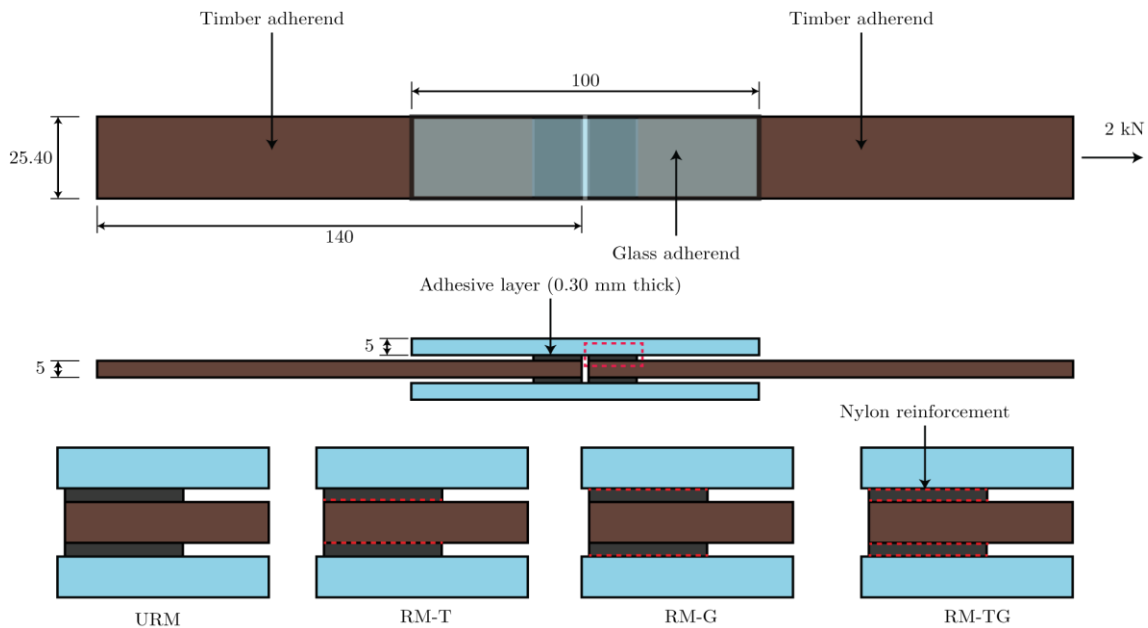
Double-lap adhesive joint, plan and section view (measures in mm)
